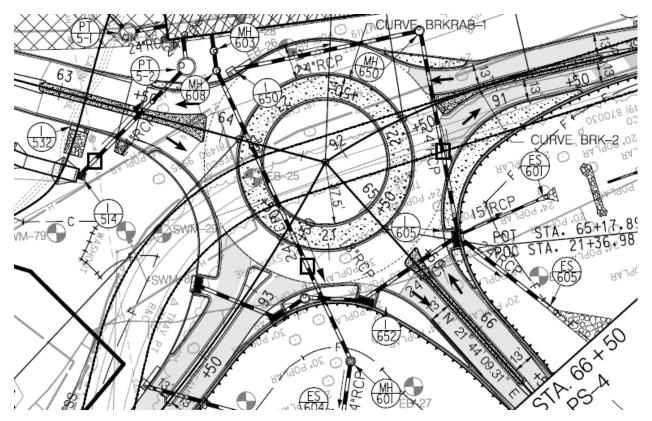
Proposed Roundabout at MD97 Brookeville Bypass and Brookeville Road
